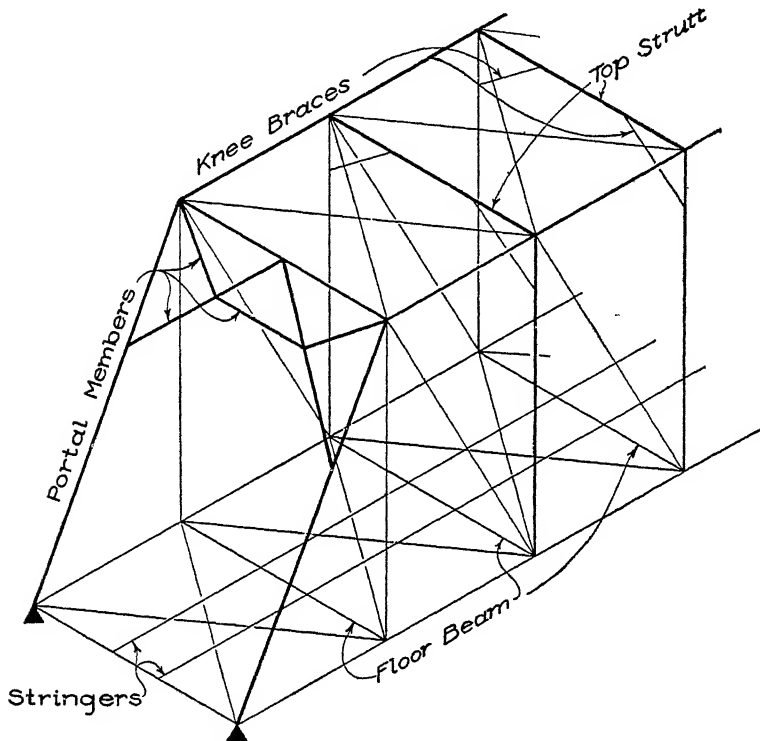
Through Bridge, Showing Top and Bottom Systems of Lateral Bracing, also Portal Bracing and Floor System.
